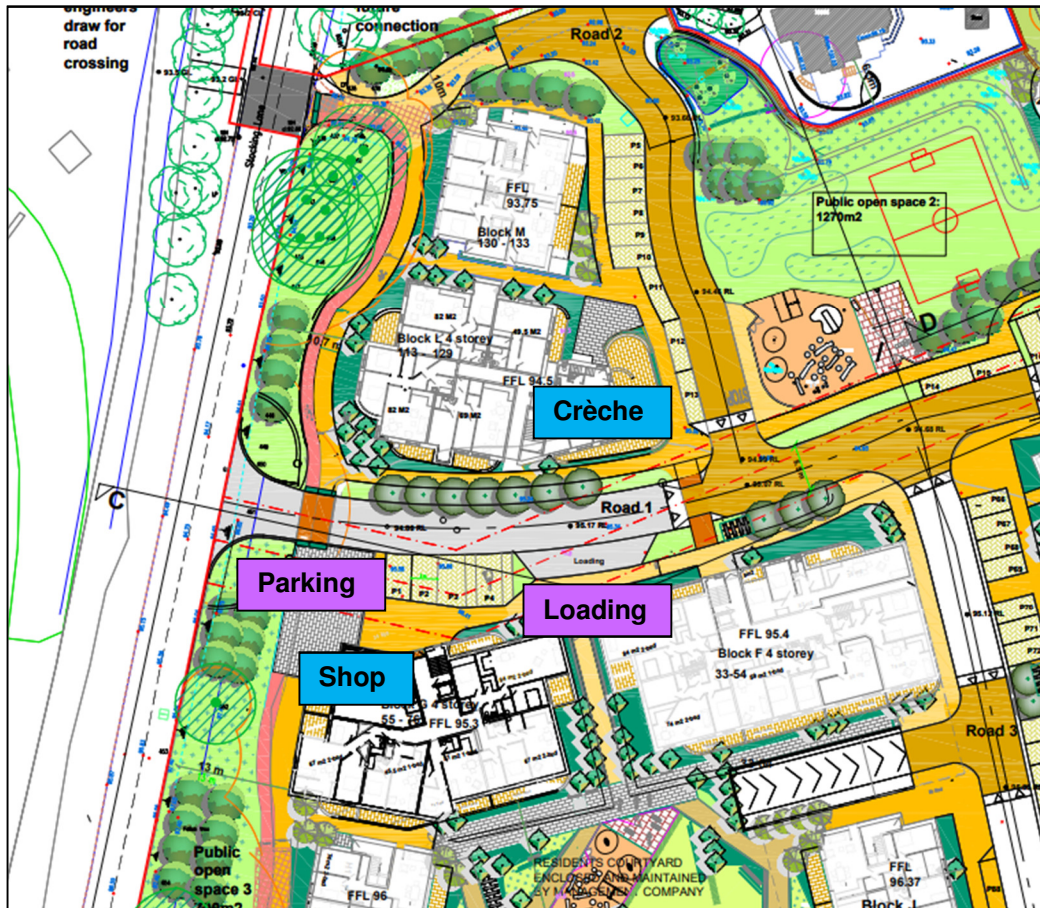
PROPOSED ACCESS ROAD FROM STOCKING LANE
